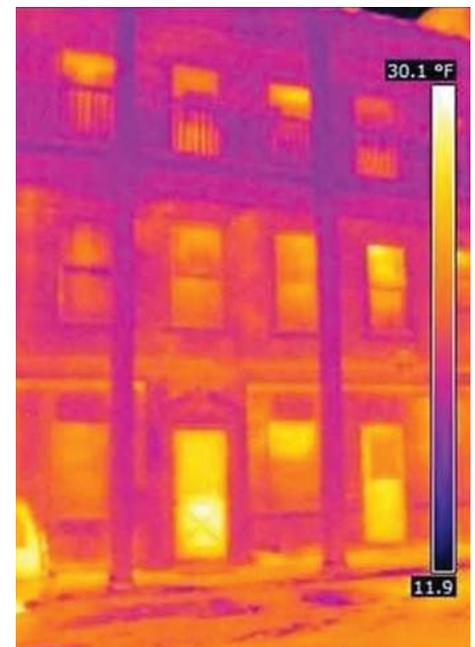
(center and right) The left thermal image shows the walls of this building before insulating. After insulation was added, the cooler and, thus darker exterior walls evidence how much the heat loss has been reduced. Photos: EYP Architecture & Engineering.
